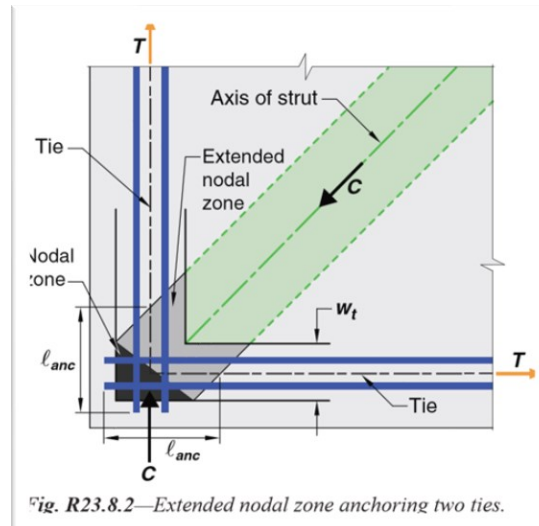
Extended nodal zone anchoring two ties.
